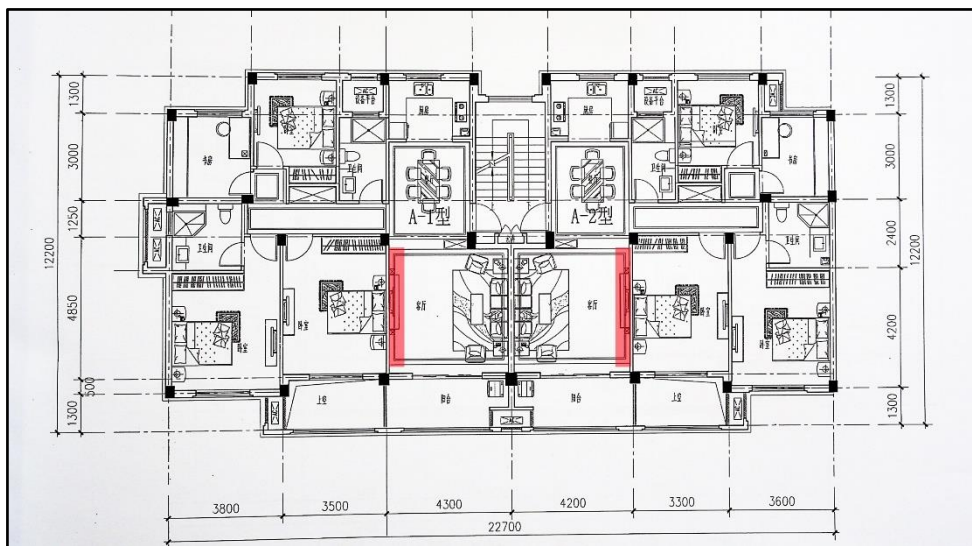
A plan of an apartment in NRD; the walls marked by red are the ‘background wall’ (source: Author).
